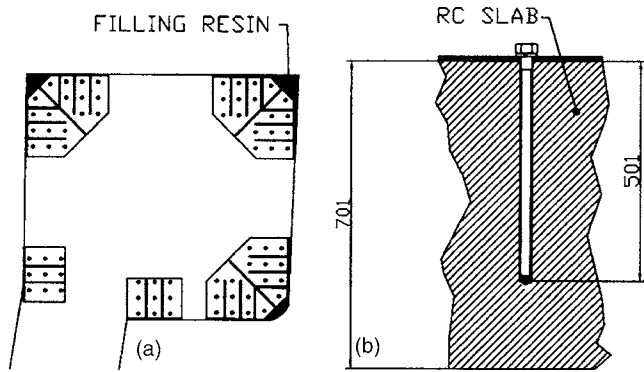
(a) Base anchoring plan view; (b) anchoring system detail
